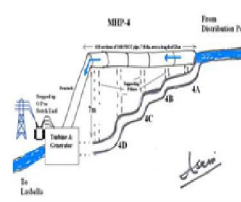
Civil Work Sketch for Raising Water Heads from 1.5 meters to 6.8 meters for MHPP-4
